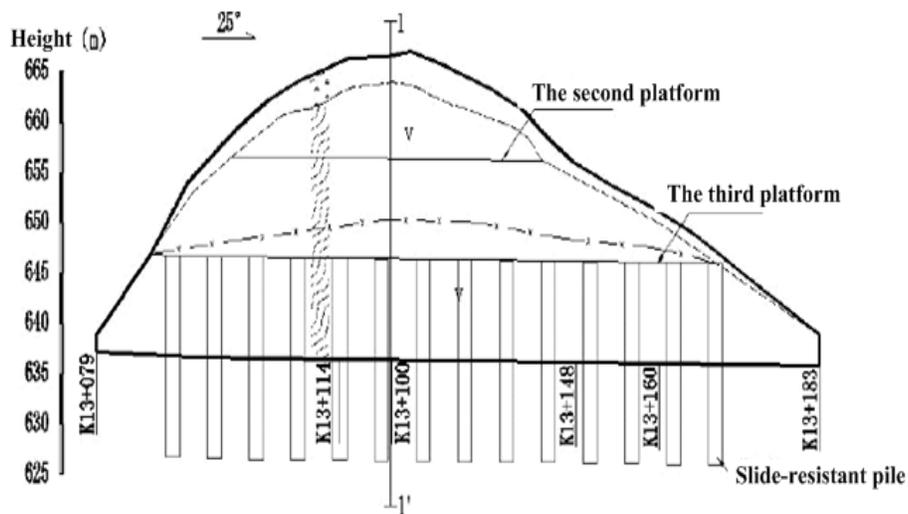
Elevation of the slope in K13+090-168 section of fault zone
